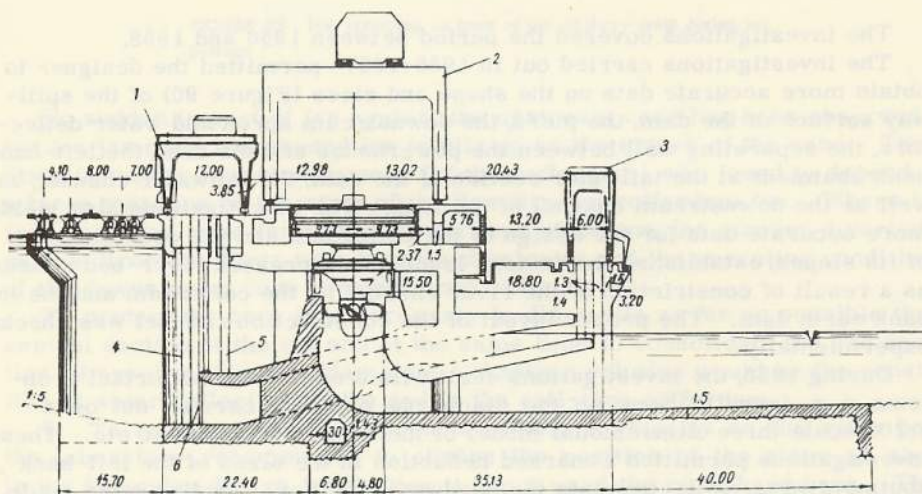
HEP powerhouse built within a pier (section along the center line of the turbine units)
